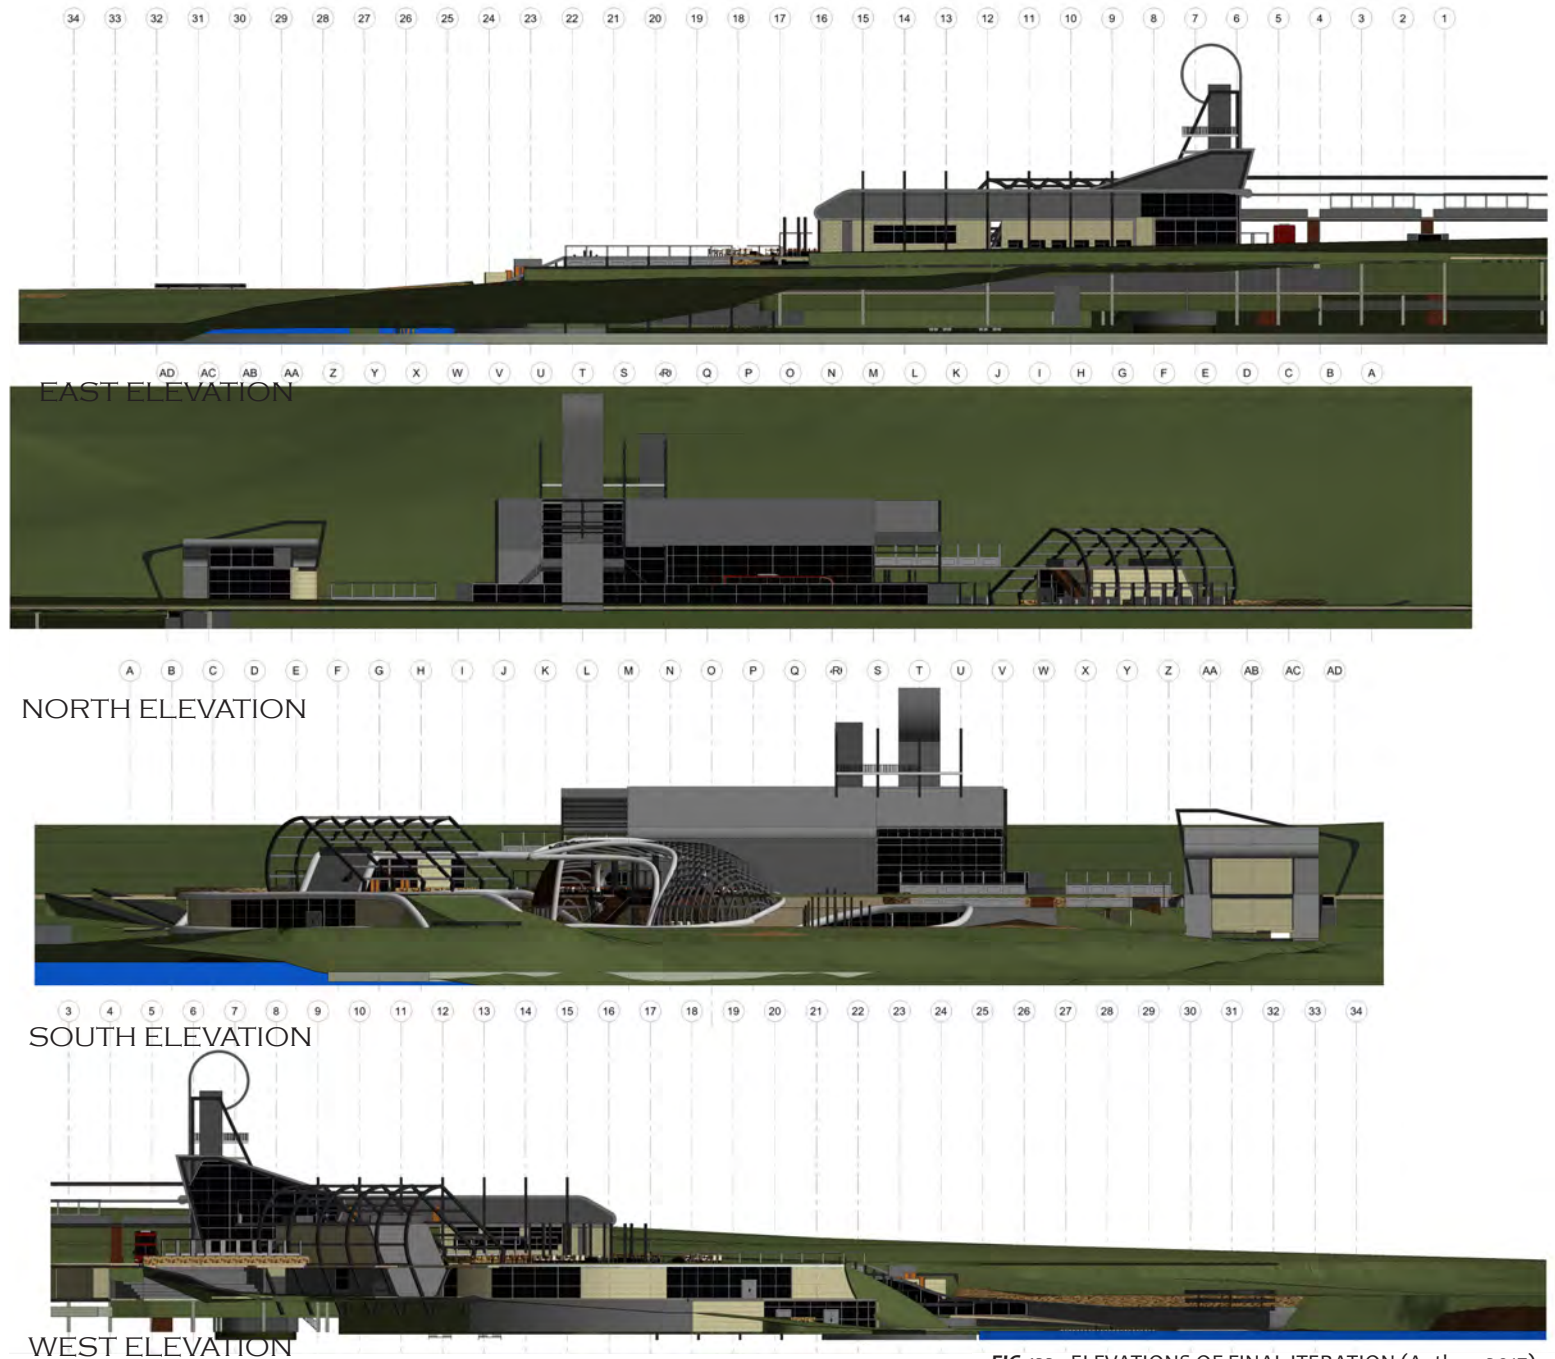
ELEVATIONS OF FINAL ITERATION (Author, 2017)
